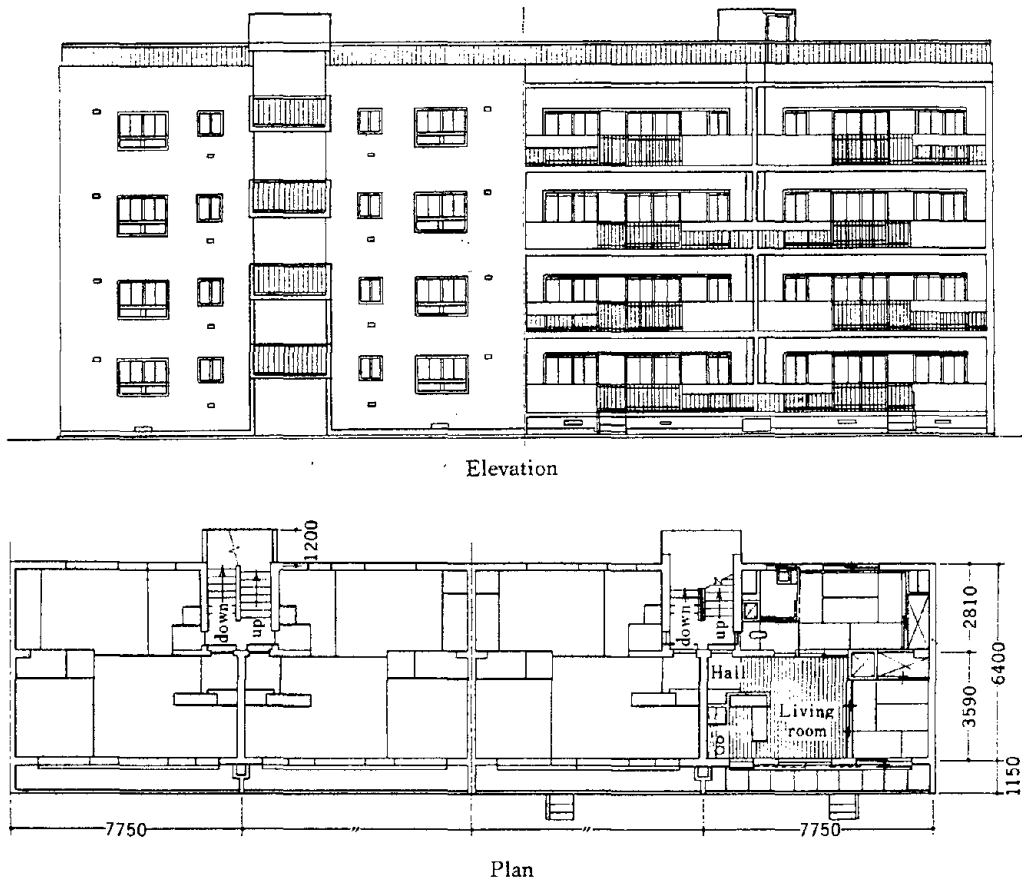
Typical bearing wall construction geometry [AIJ, 1970]
